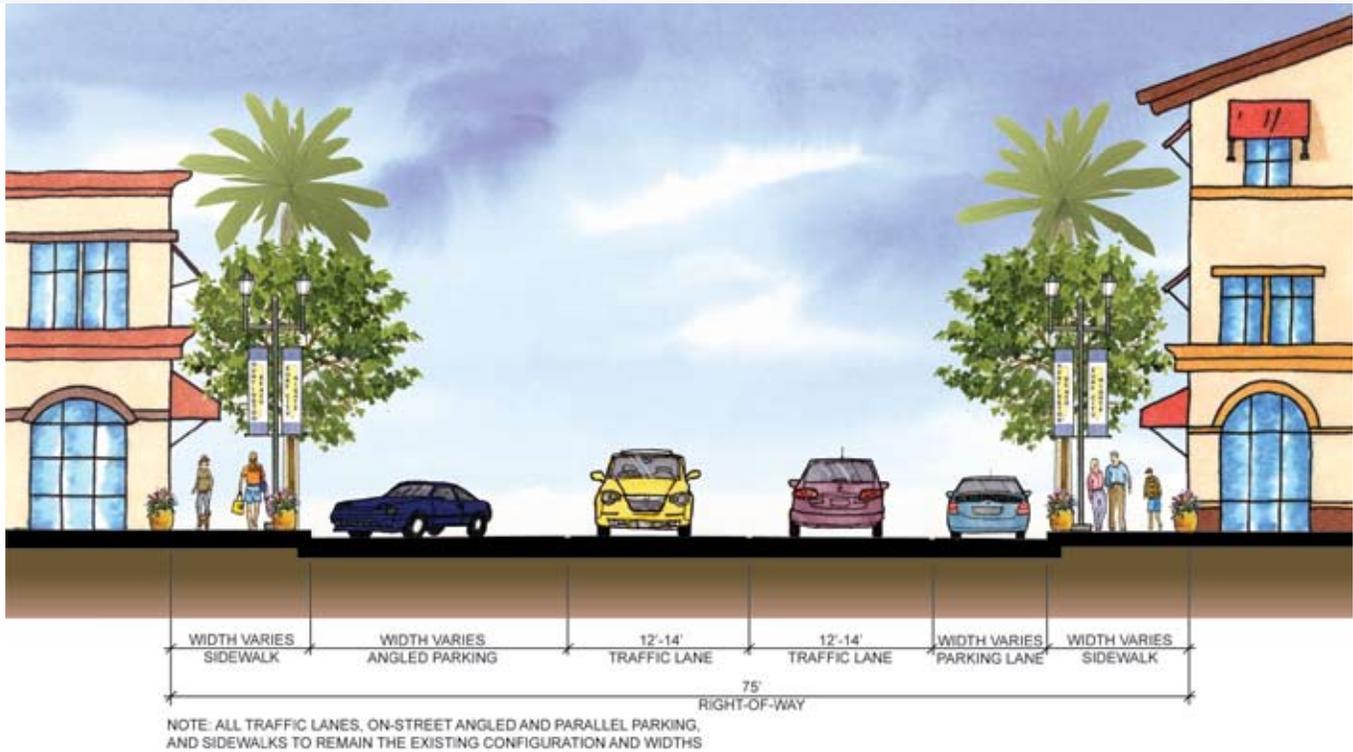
Cross section of Main Street from Orange Avenue to Acacia Avenue
